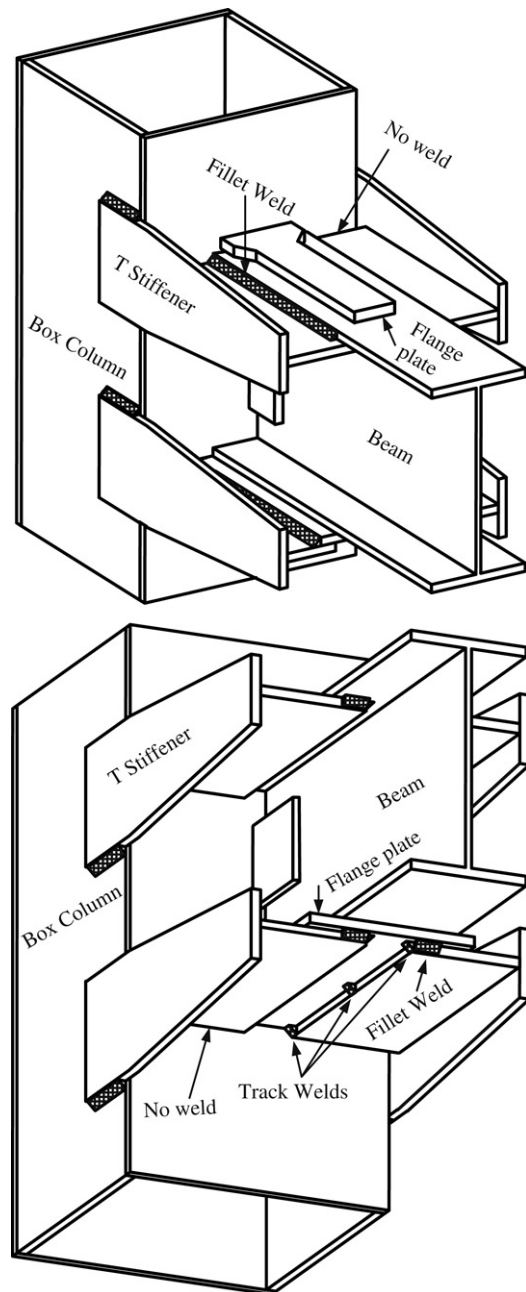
Proposed joining configuration of the T-stiffener to the flange plate connection, top and bottom view.
